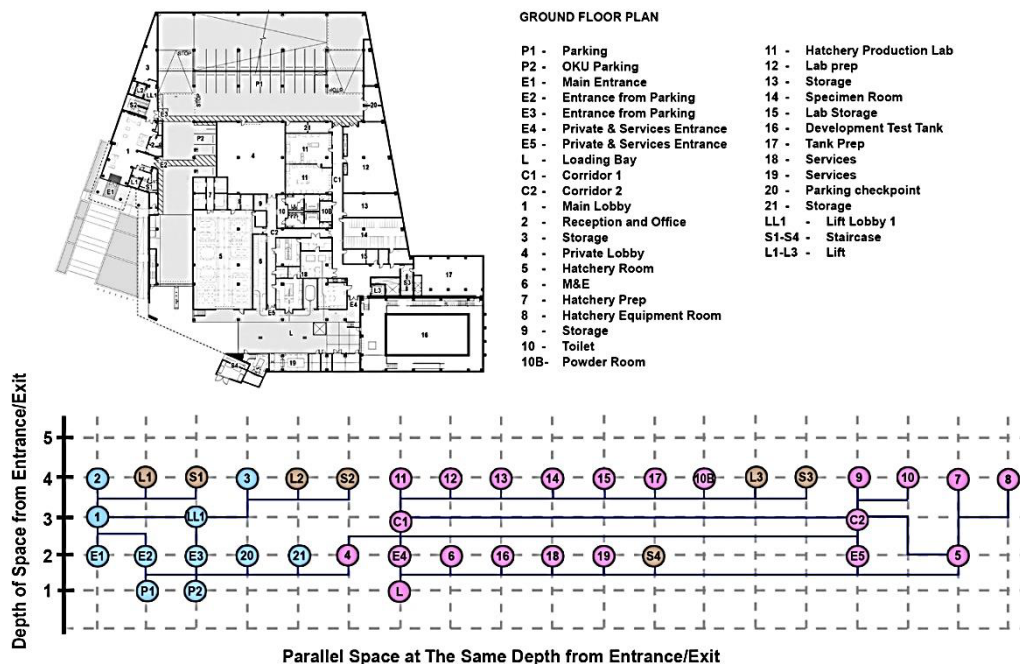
Ground Floor Plan, Legend and Justified Graph showing Ground Floor plan's circulation in NOAA Southwest Fisheries Science Center
